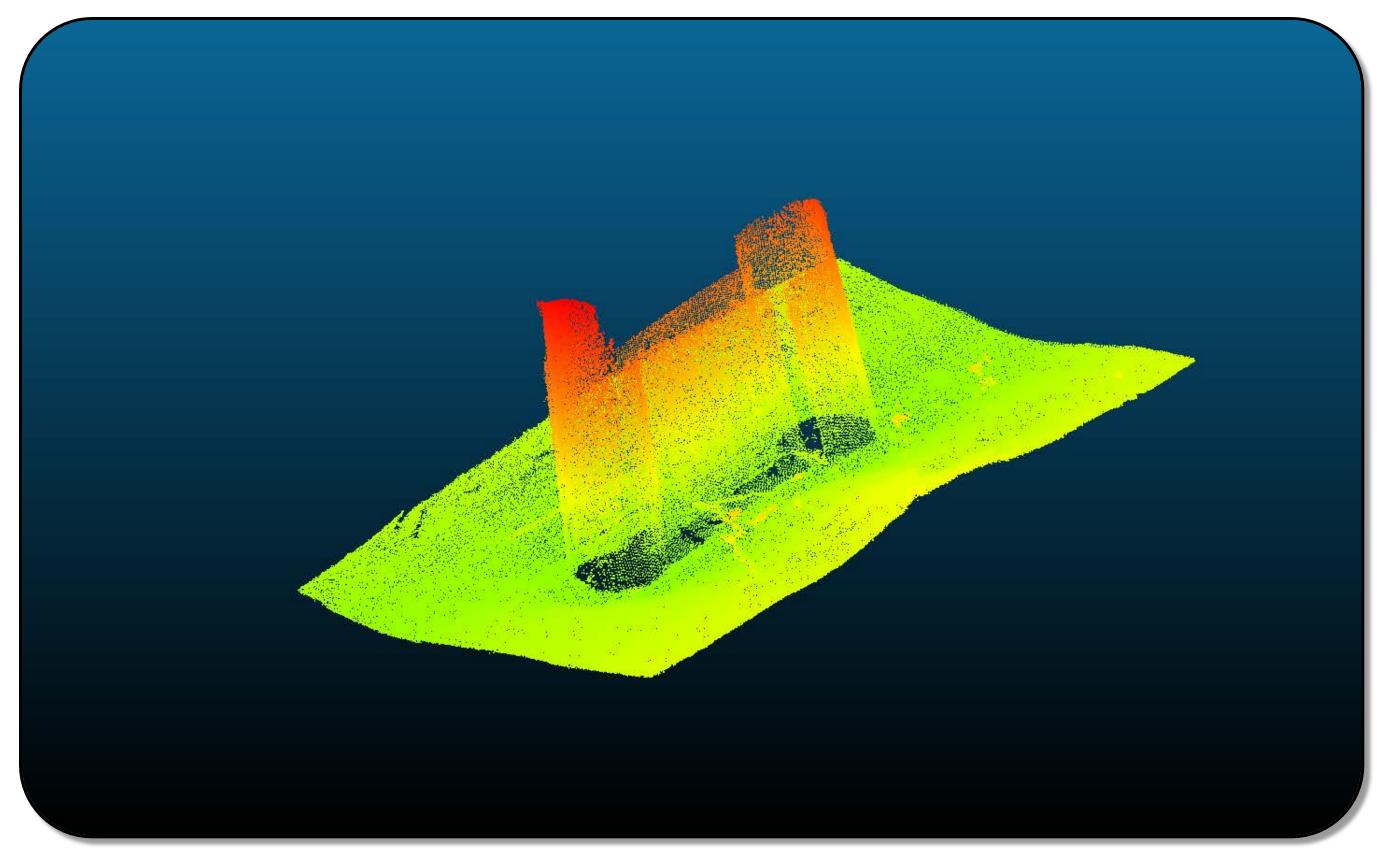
Perspective view of Pier 16 point cloud (looking from the northeast direction).
